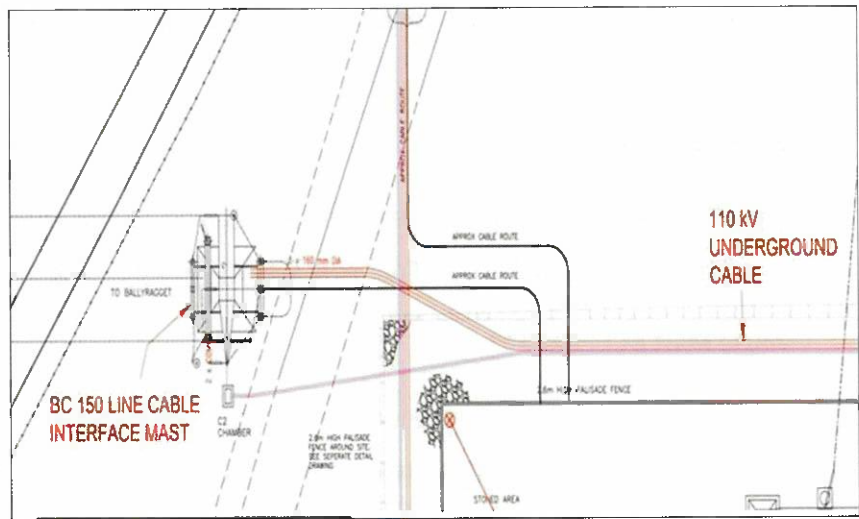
Mast Angle Mast BC150 as per Plan Layout
